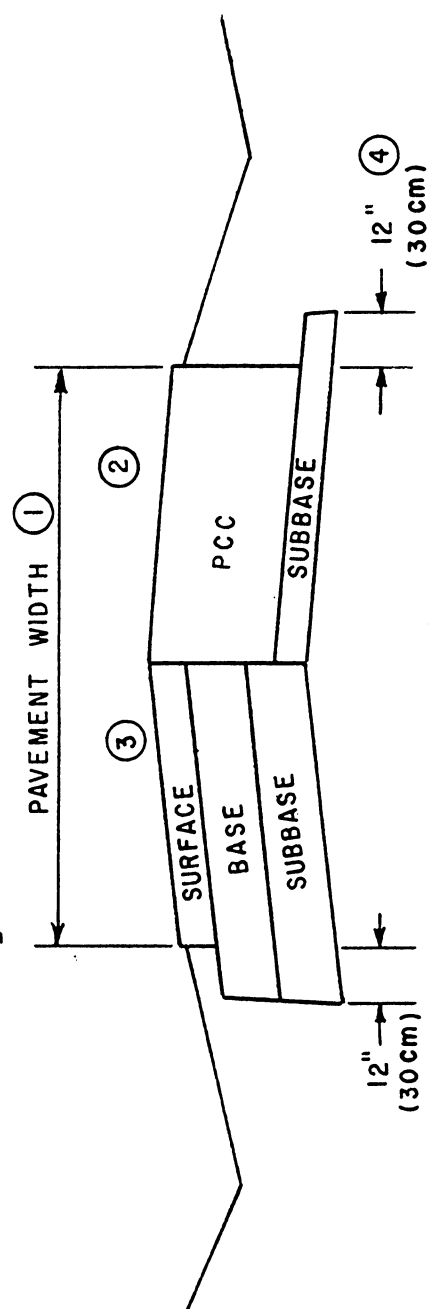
TYPICAL SECTIONS FOR LIGHT AIRCRAFT PAVEMENTS
